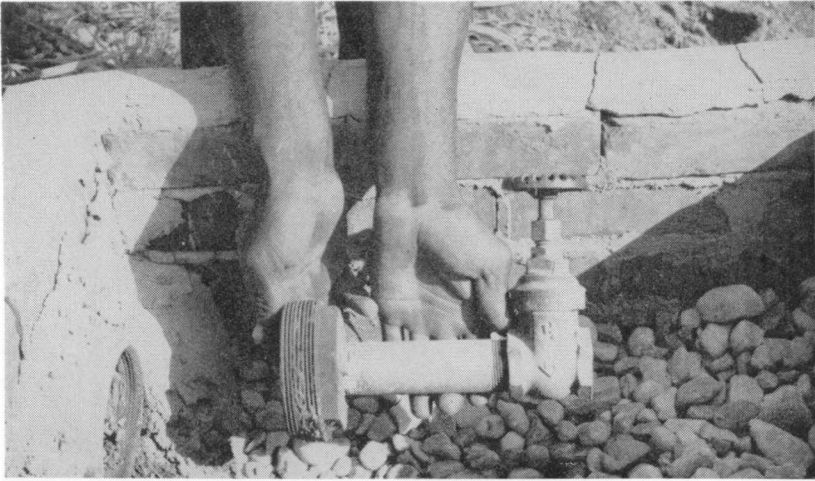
A 4" inlet pipe may be used to fill the pond, and a bushing equipped with a 1 $\frac{1}{4}$ " nipple and gate valve then screwed in. The gate valve may be regulated to maintain the water level.
